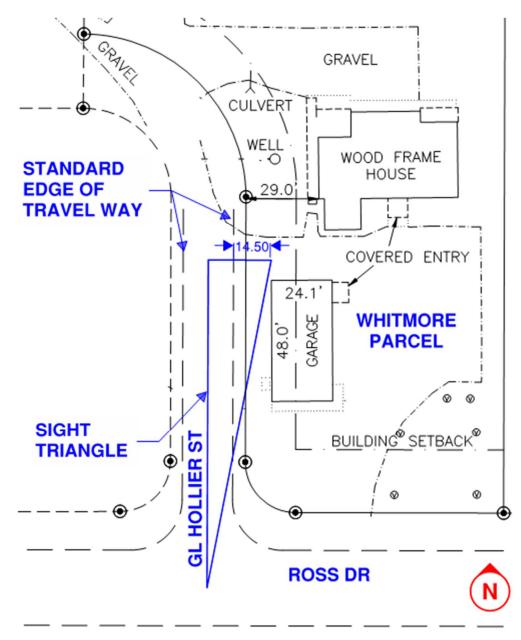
Sight triangle shown on site as-built from Peninsula Surveying, LLC
